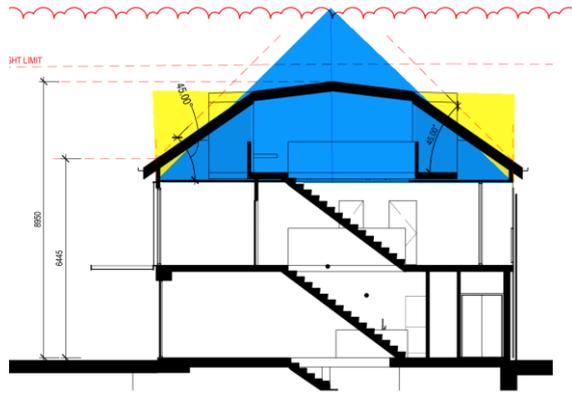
Assessment demonstration of one of the development's proposed building. Approximate required roof form envelope of 45° is highlighted in blue and protrusion is highlighted in yellow.
